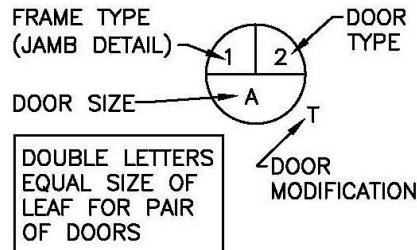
DETAIL TITLE / DOOR SCHEDULE, LEGEND, NOTES
